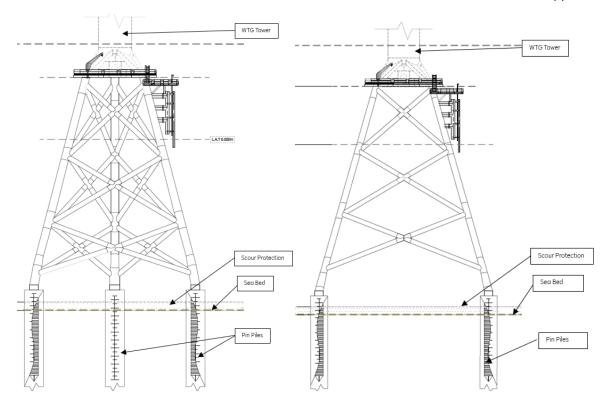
Example of three and four multileg foundations supporting a WTG tower
